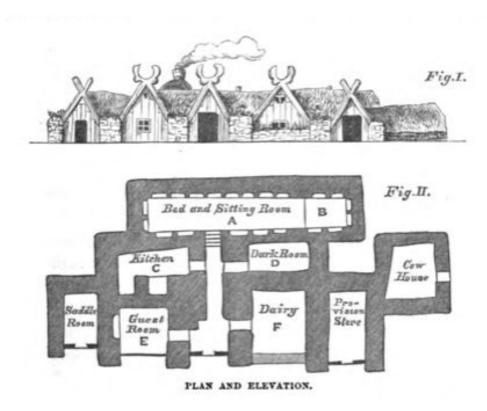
Plan and Elevation. Sabine Baring-Gould.
